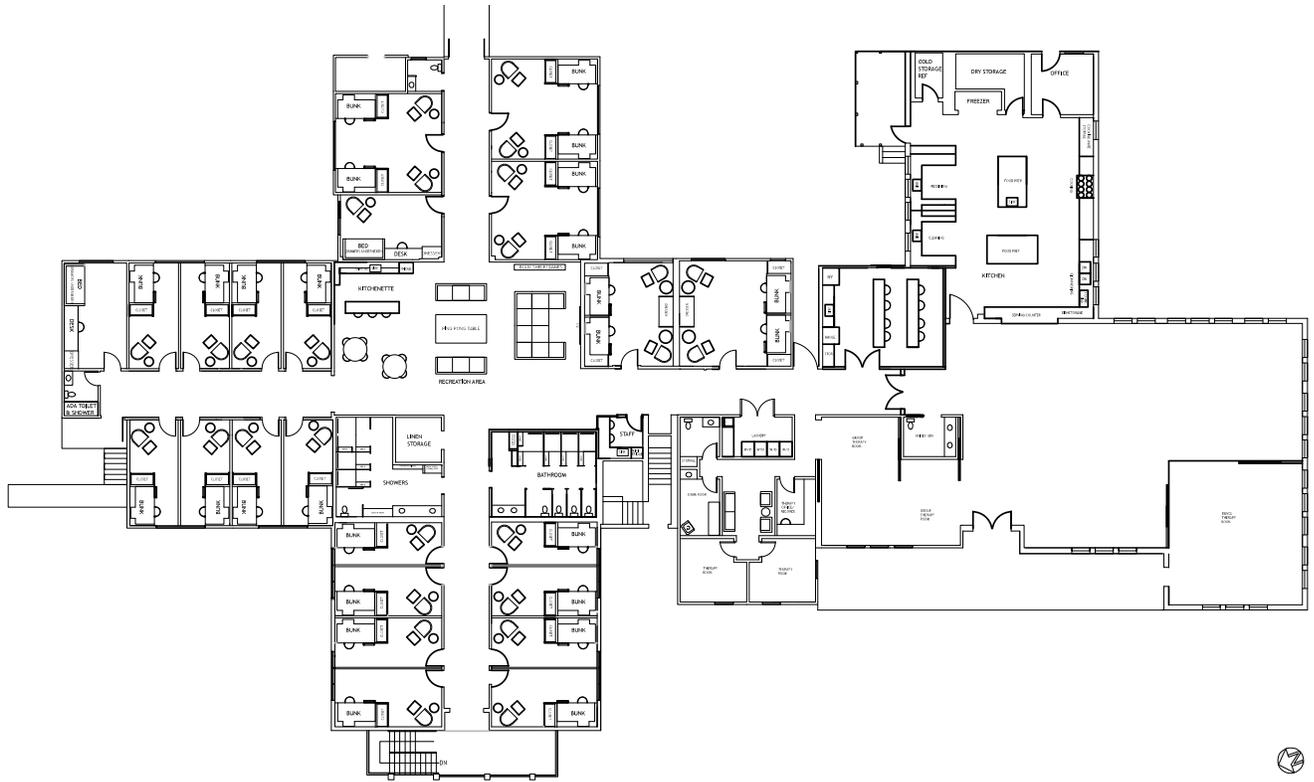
Proposed 2<sup>nd</sup> Floor Plan.
